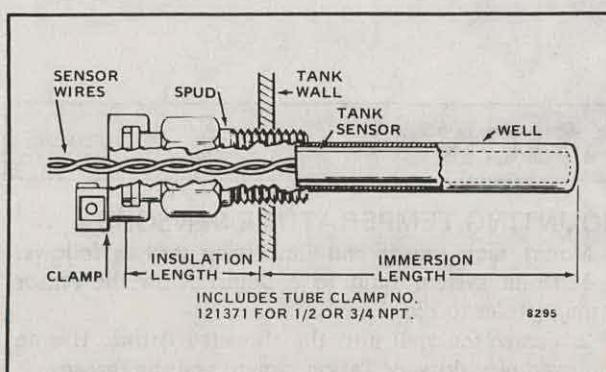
TANK SENSOR INSERTED IN IMMERSION WELL.
